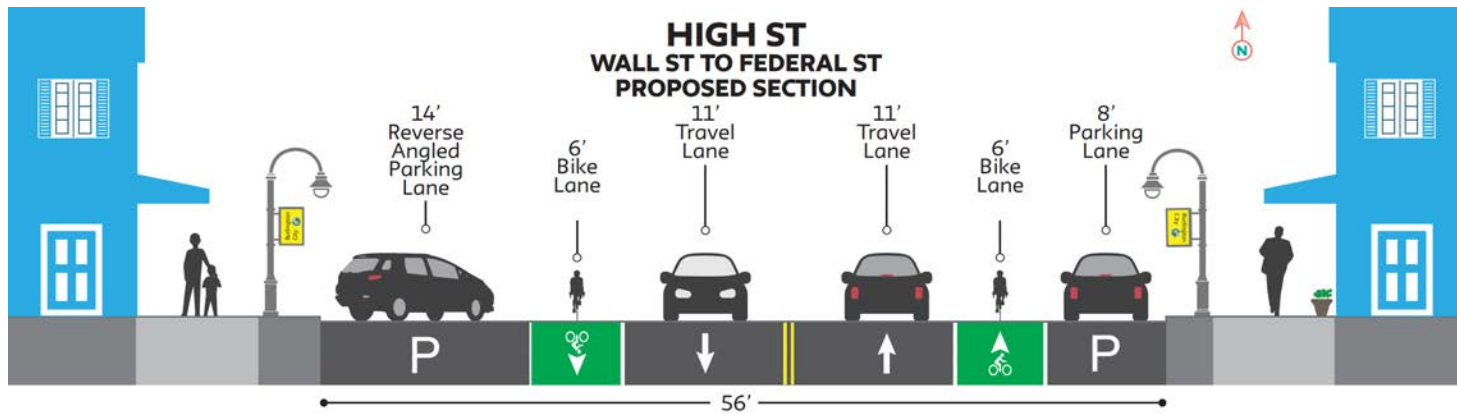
Proposed Cross Section High Street - Wall Street to Federal Street
